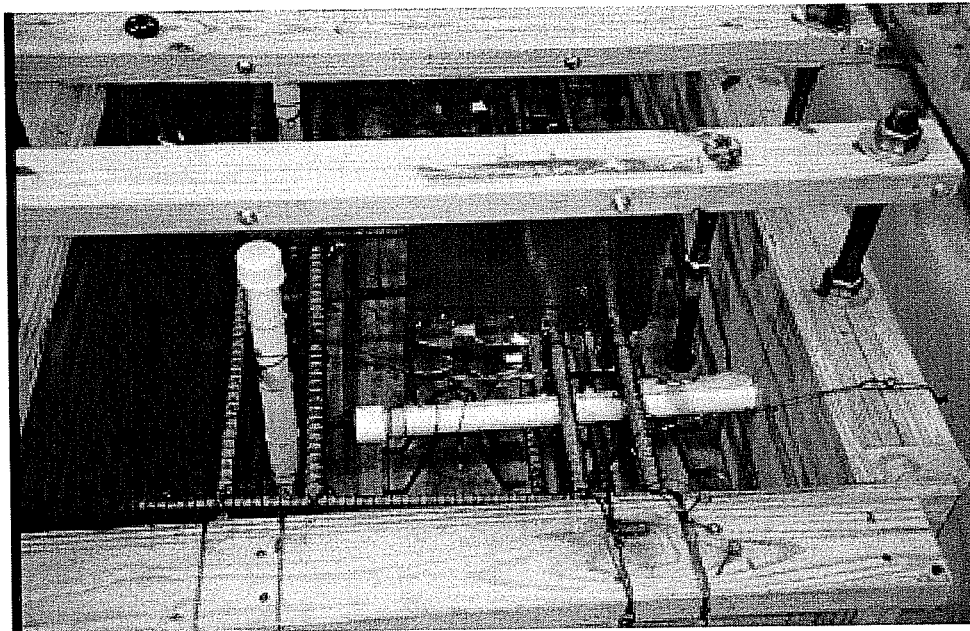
Location of PVC Pipes for Shear Tests in Cracked Concrete
